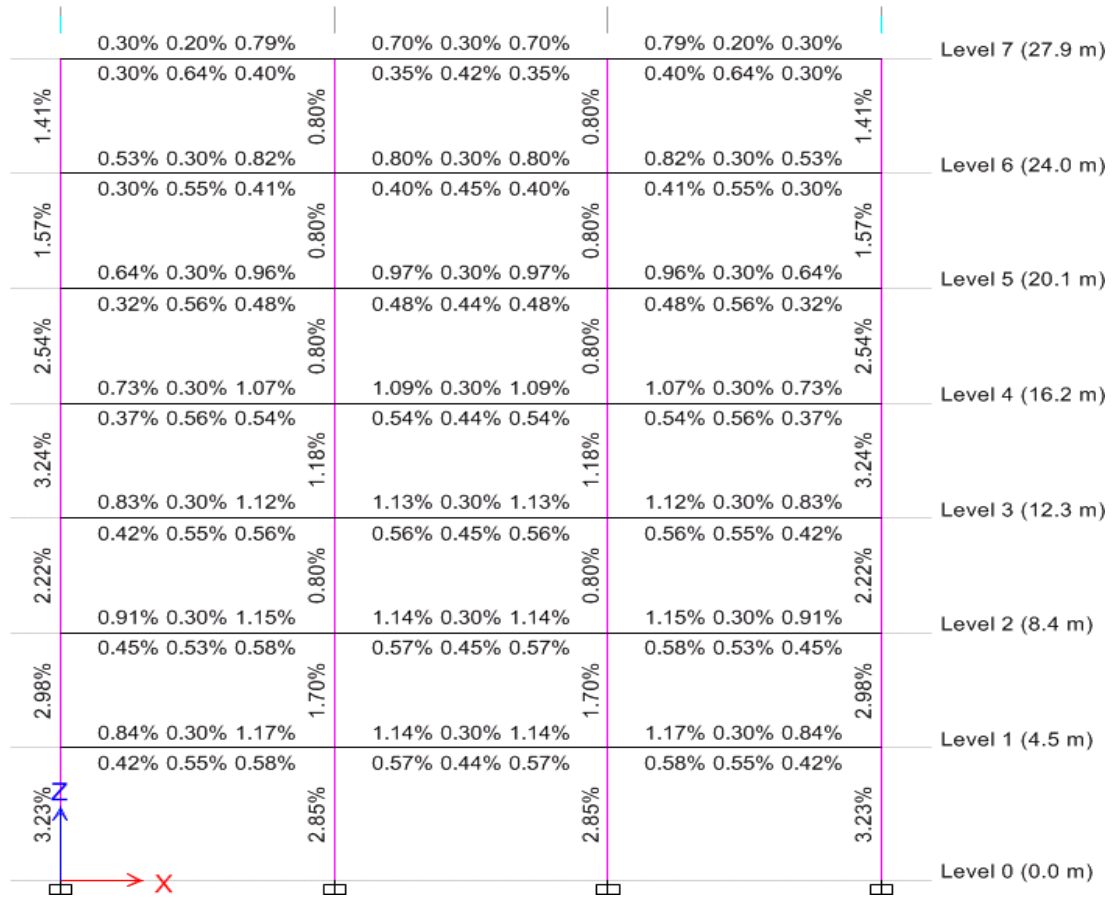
Required longitudinal reinforcement for building ID 2215
